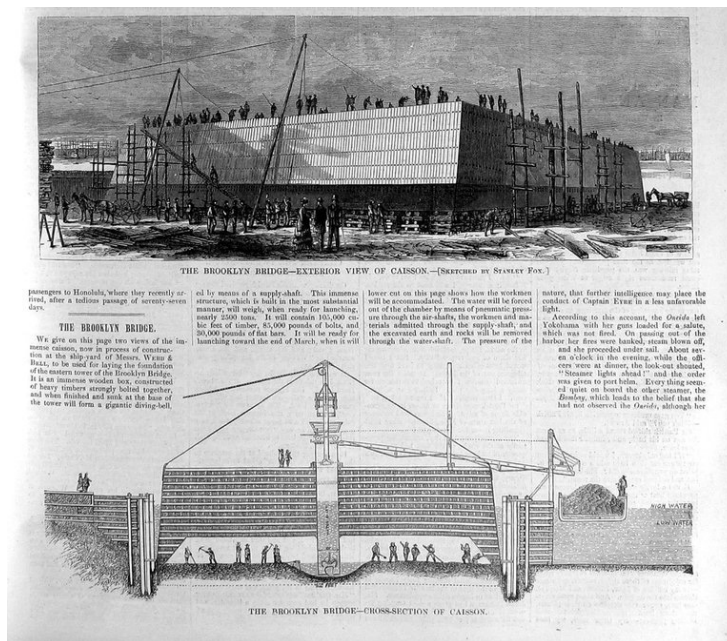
Pressurized caissons of Brooklyn Bridge piers.
